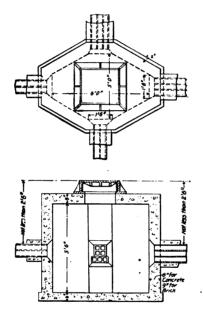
Vault Size 4 to be Used on Runs of 4 to 8 Ducts of Conduit when Intersected.
